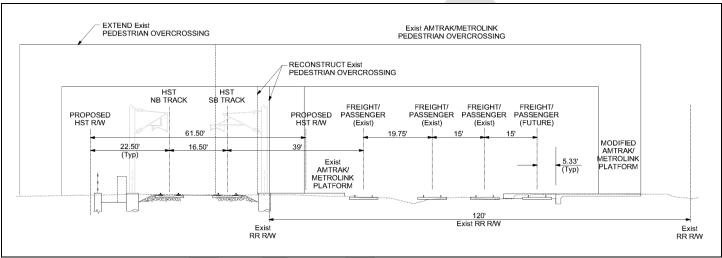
Typical Cross-Section – Buena Park Metrolink Station – Underpass Option
